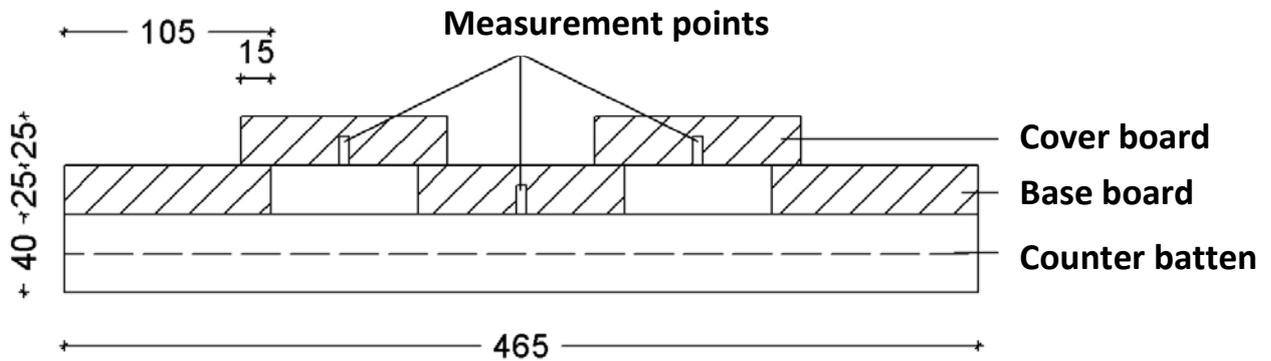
Position of measurement points in the board-on-board cladding of the test house (dimensions in mm)
